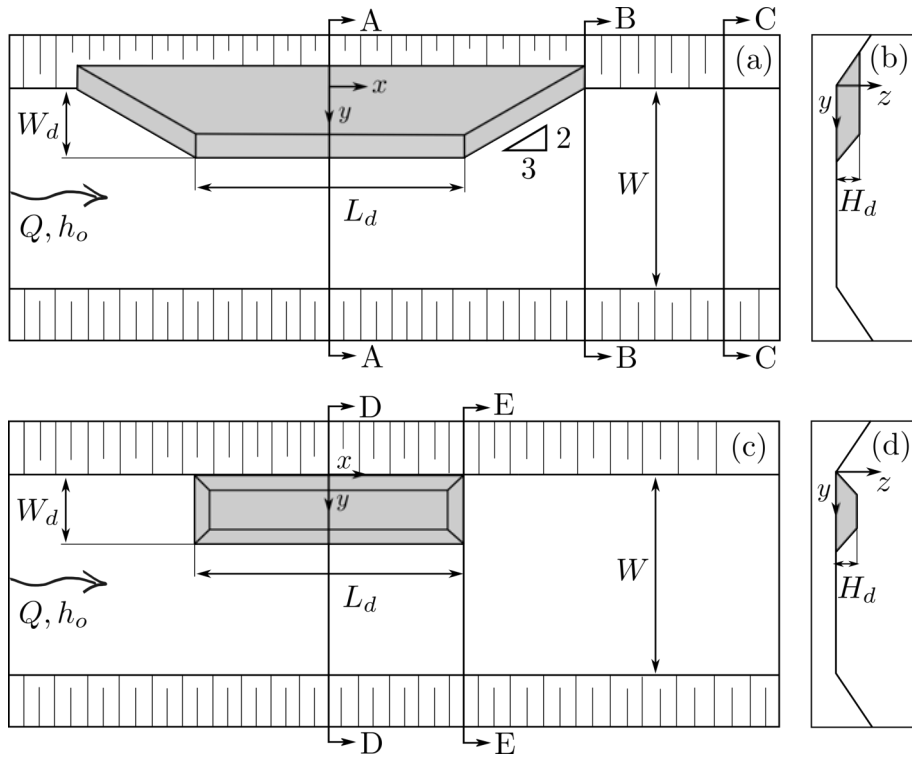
Geometry of trapezoidal gravel deposit (connected to shore) with plan view (a), cross section A-A (b) and rectangular gravel deposit (off shore) with plan view (c), cross section D-D (d)
